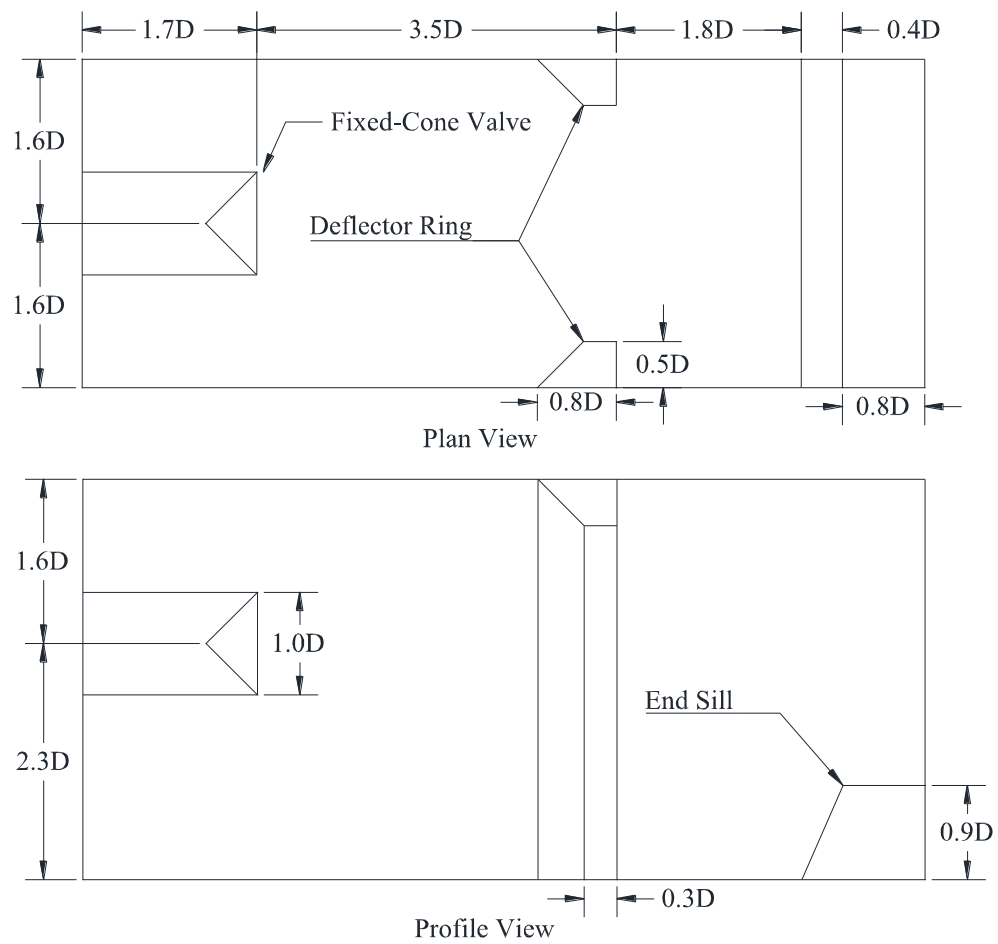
Containment structure with deflector ring and end sill in Cross-section 1.
